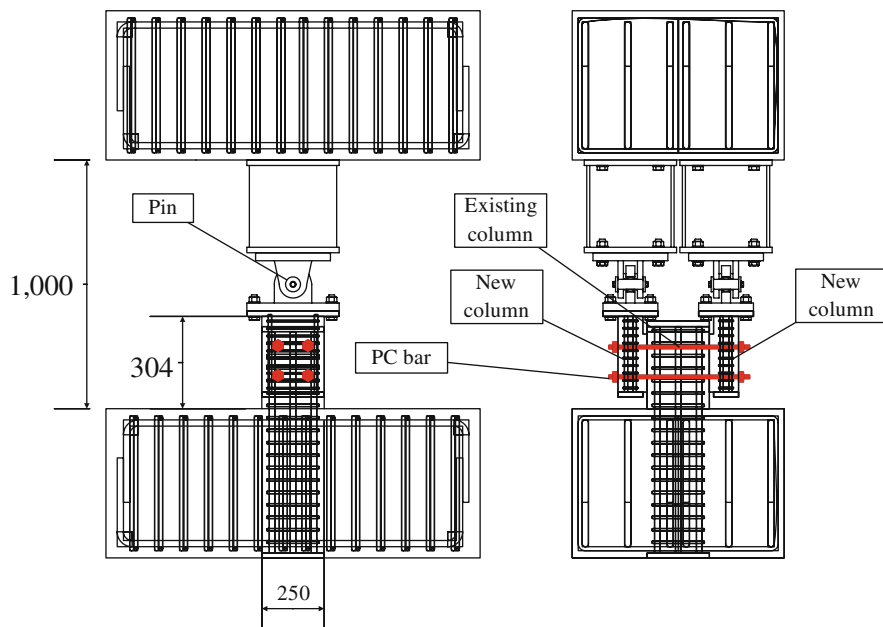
Specimens (See also Plate 15 in Color Plate Section on page 464)
